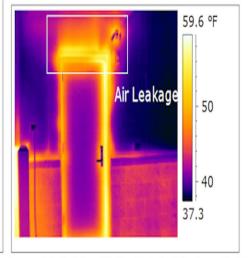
Building 10 Air Leakage Pathways @-25Pa Image 6-4. Building 10 Plan Detail of the Eave @+25pa
